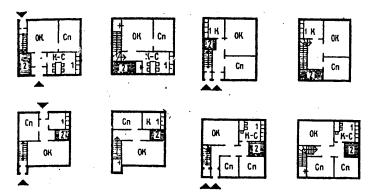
Layouts of blocked houses with floor-by-floor arrangement of the apartments.
